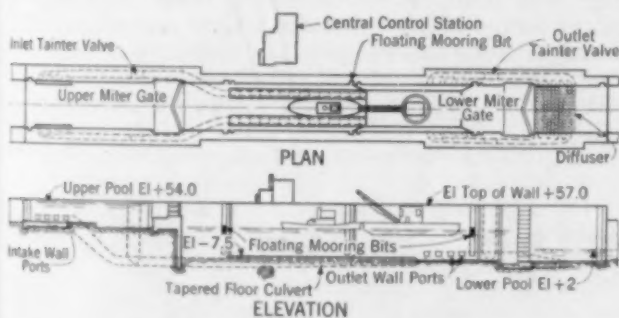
PROPOSED RECONSTRUCTION OF WILLAMETTE FALLS LOCK
